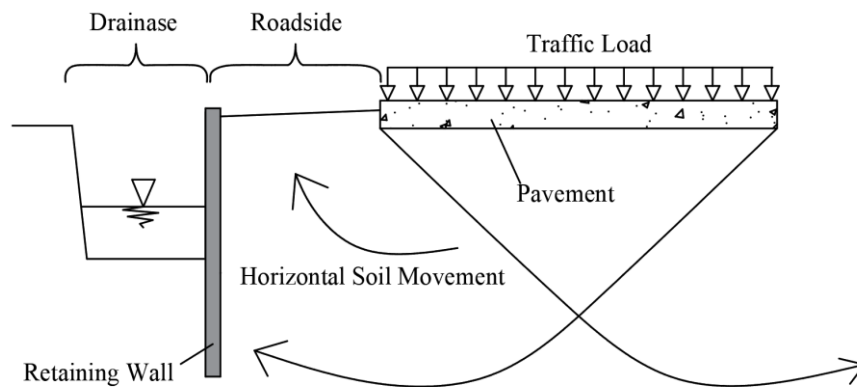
Horizontal subgrade movement under the slab caused by traffic loading
